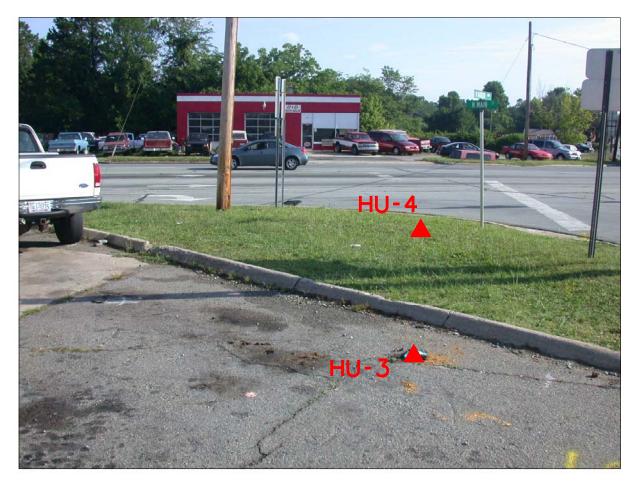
BORINGS AT HUMPHRIED PROPERTY LOOKING NORTH FROM STREET
